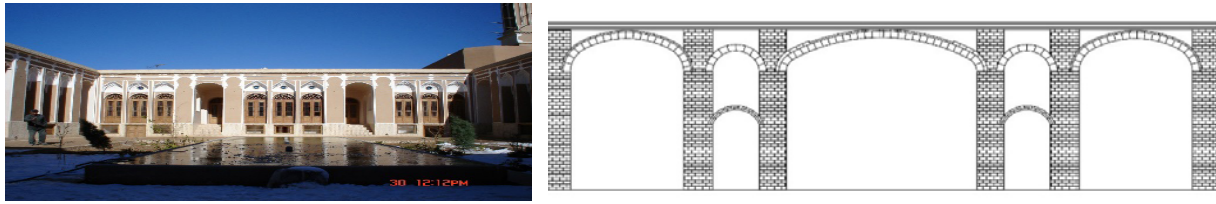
Elevation view and 2D modelling of an adobe house in Yazd, Iran
